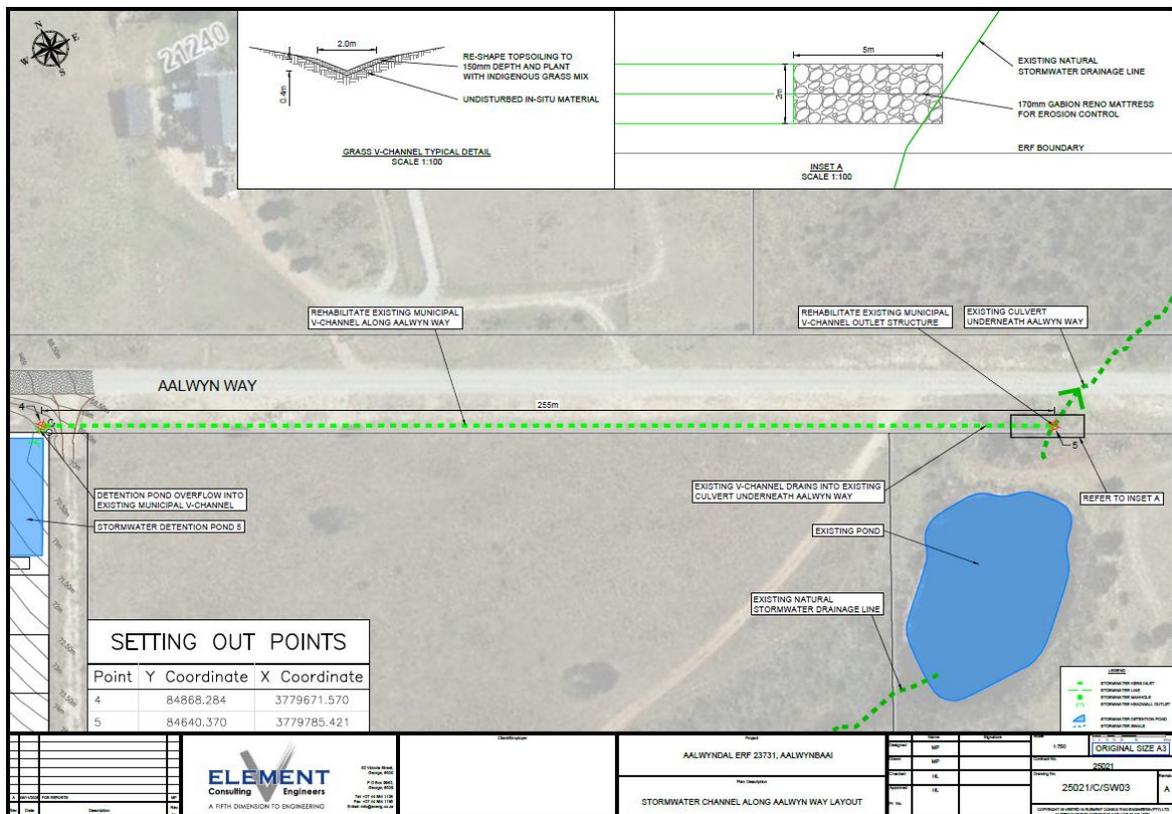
Conceptual plan proposed for the upgrade of the stormwater V-drain leading to the outlet to the stream adjacent to Aalwyn Way.
